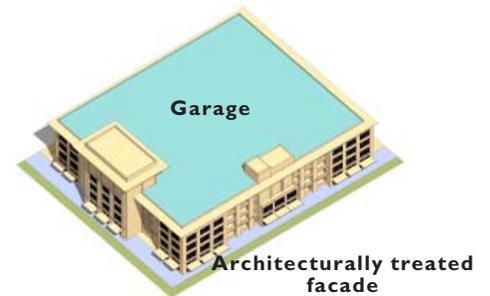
Parking garage revealed to the street with architecturally articulated facade and, in some cases, ground floor uses
